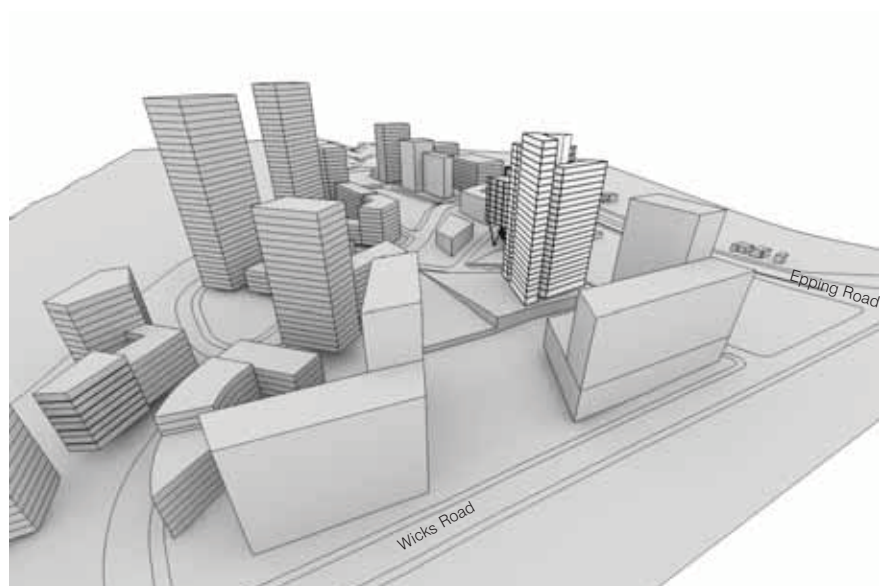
Site Opportunities_Wicks Road Precinct 3D View
